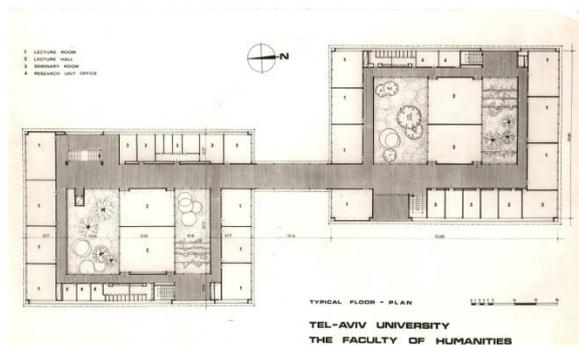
Typical floor plan of the Gilman building, a presentation plan, 1963 (courtesy of Israel Stein)
